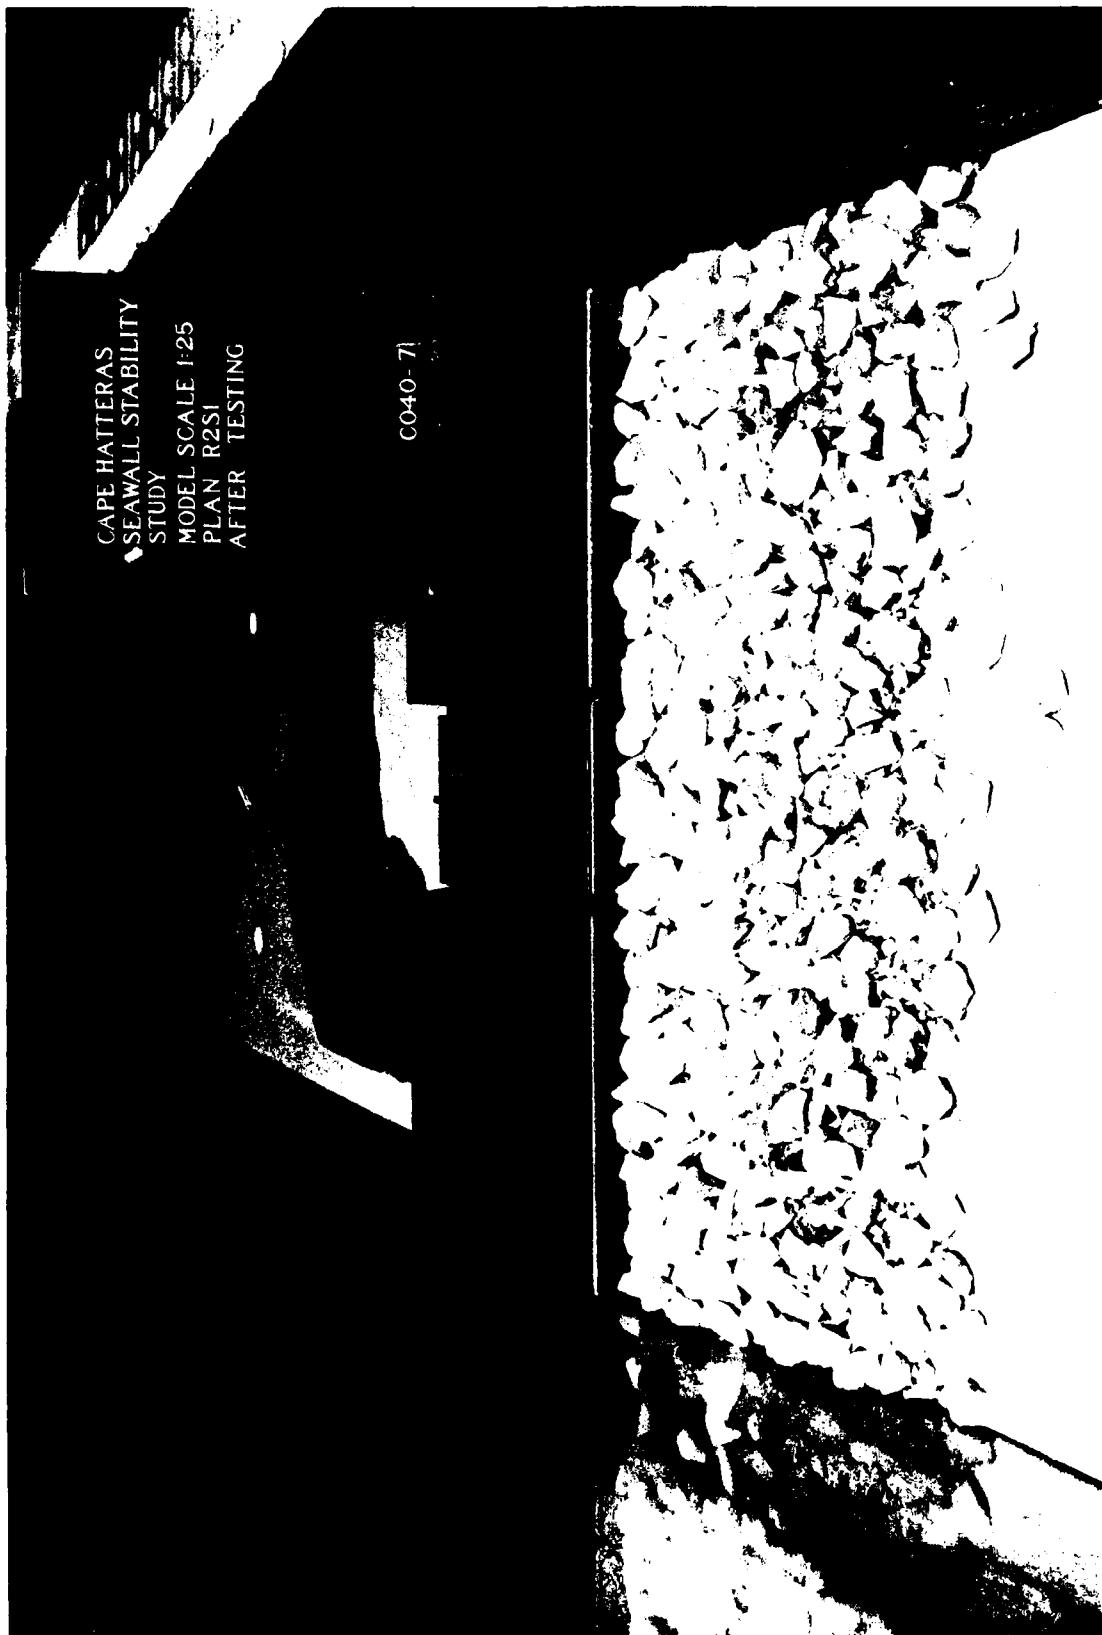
Sea-side view of Plan R2S1 after testing with the
